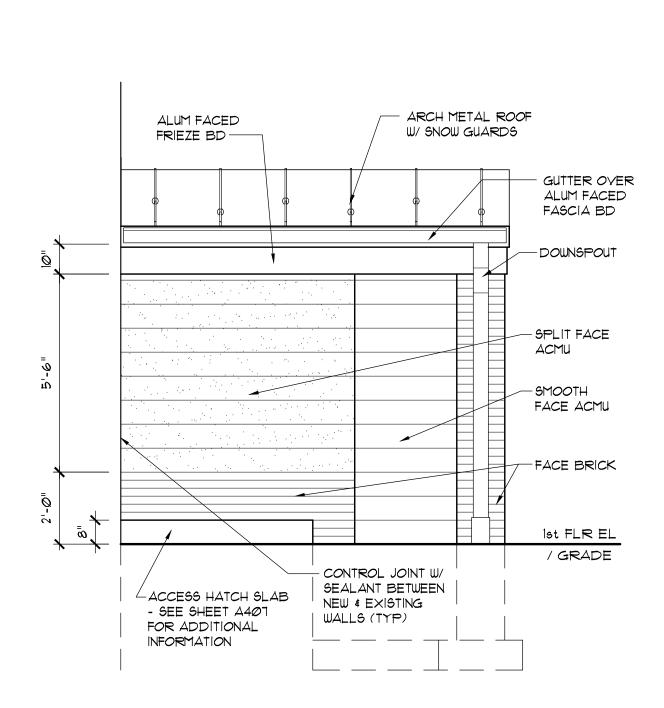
DETAIL TYPICAL AT ALL SIMILAR LOCATIONS
